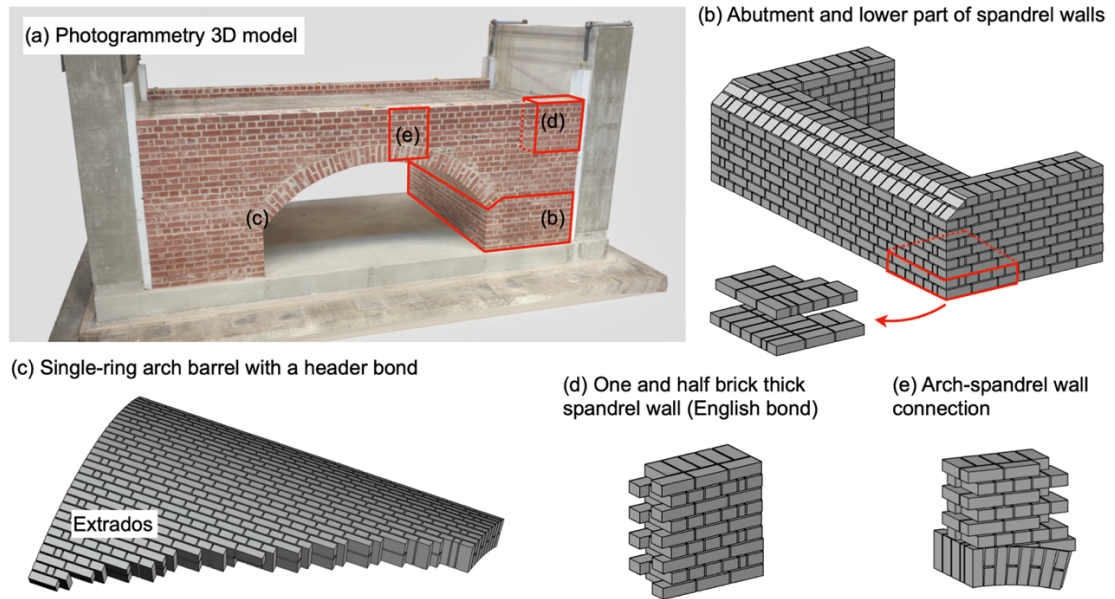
Masonry configuration (a) 3D photogrammetry model; (b) to (e) bond configurations for different elements.
